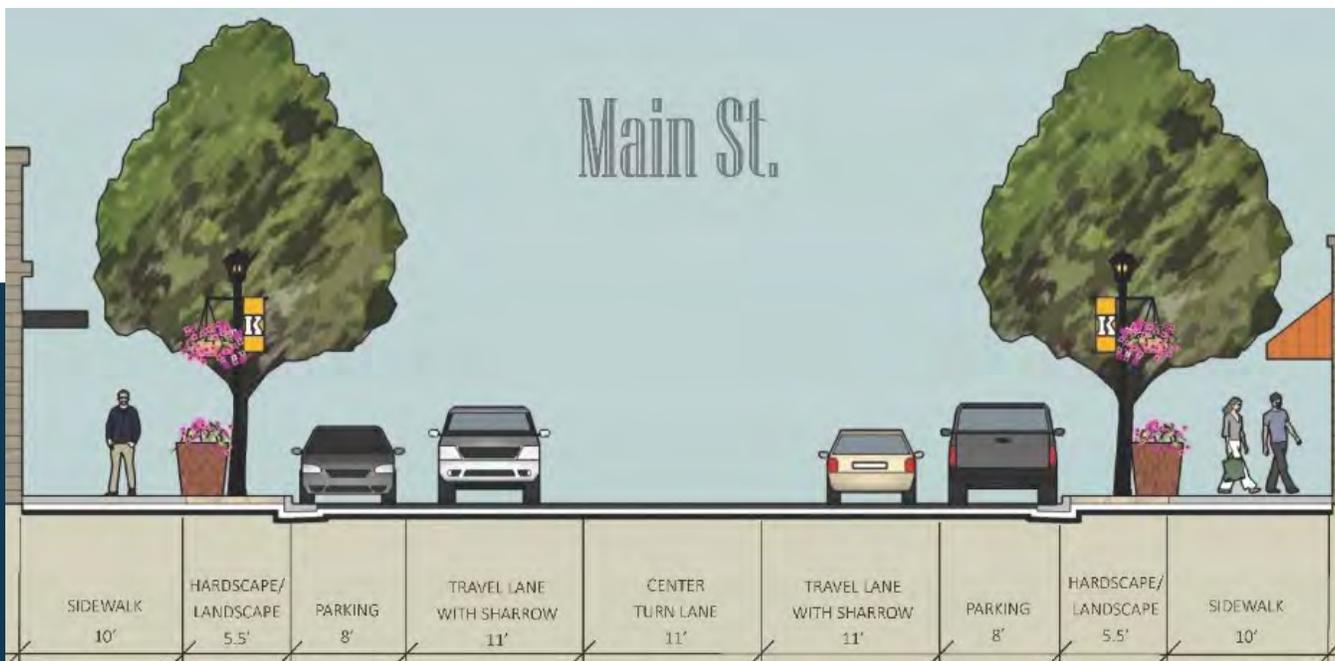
Kuna Main Street Typical Section – larger version can be found in Appendix A
